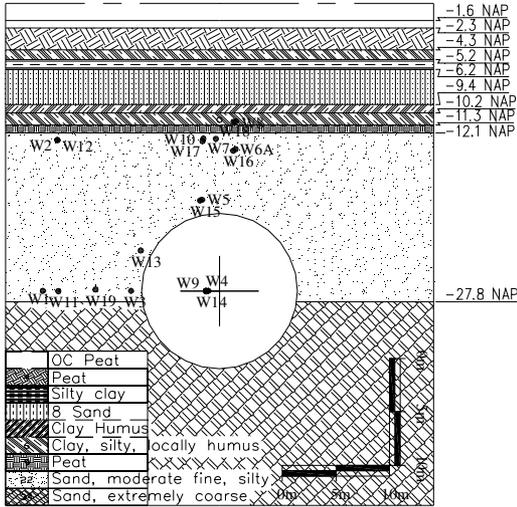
Geotechnical cross section at monitoring site (Autuori & Minec).
